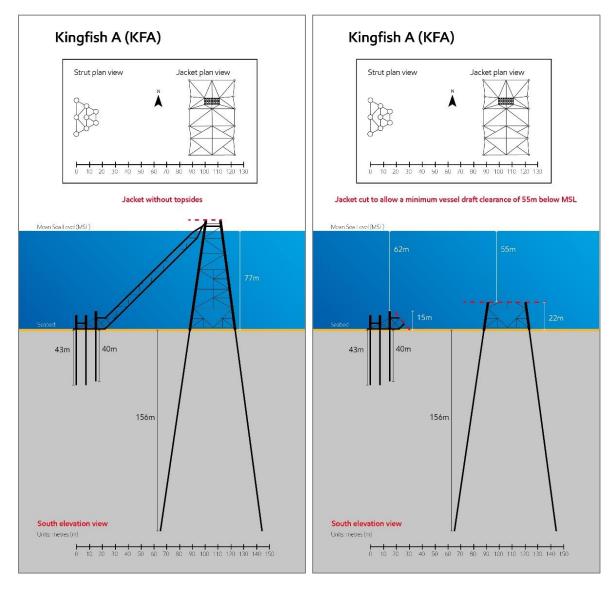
Kingfish A Steel Piled Jacket without topsides (left) and under proposed end state (right)
